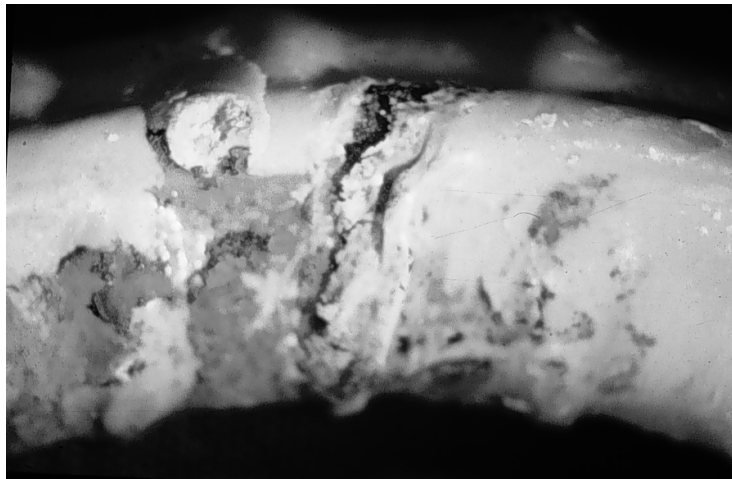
Damage of coating of stirrup at contact with uncoated bar.
